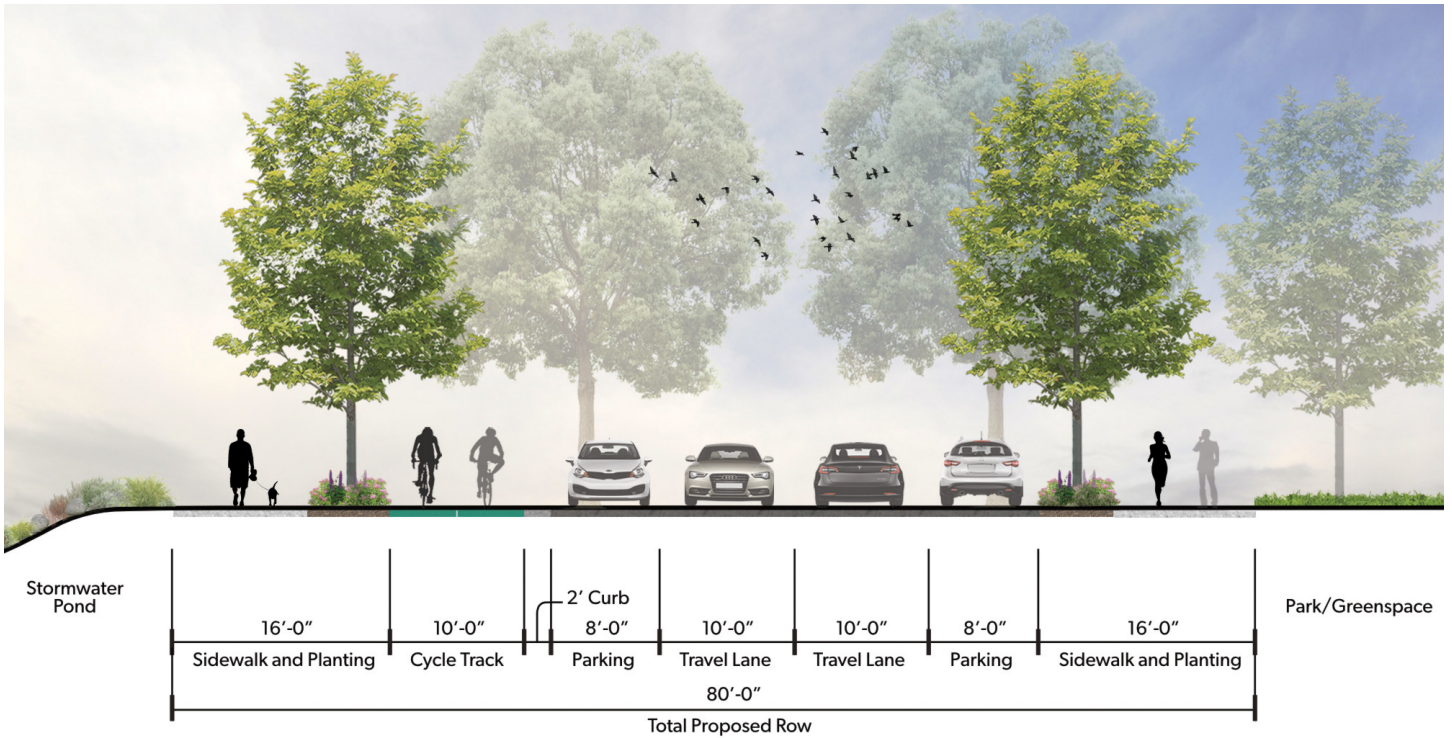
B-B | Main Street Extension at Park (Formerly Mill Creek Blvd)
